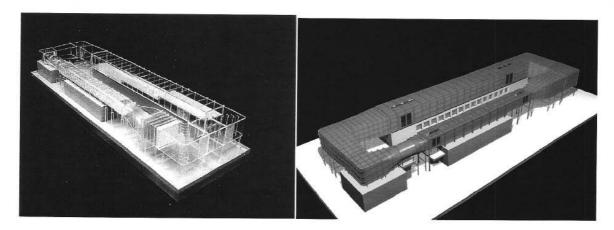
Layout of the CLP Power Wind/Wave Tunnel Facility
